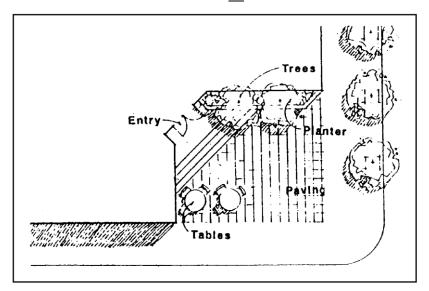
BUILDING SETBACKS MINIMIZED FROM STREET
